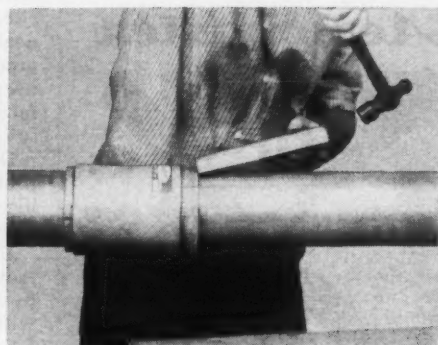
Locking wedge is driven home with block of wood and hammer. O-ring is automatically seated and sealed
